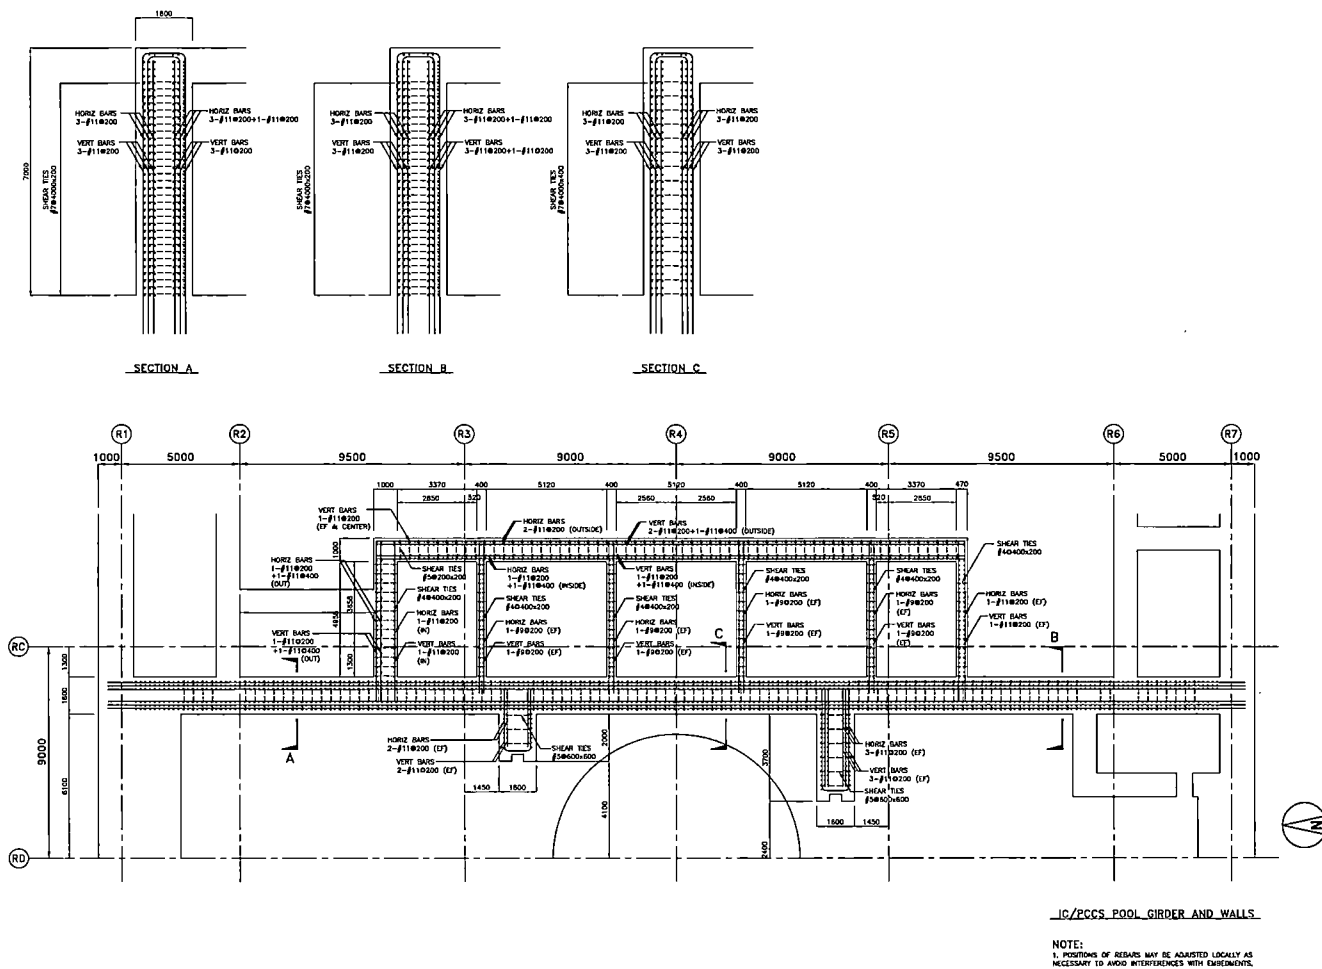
Reinforcing Steel of IC/PCCS Pool Girder
